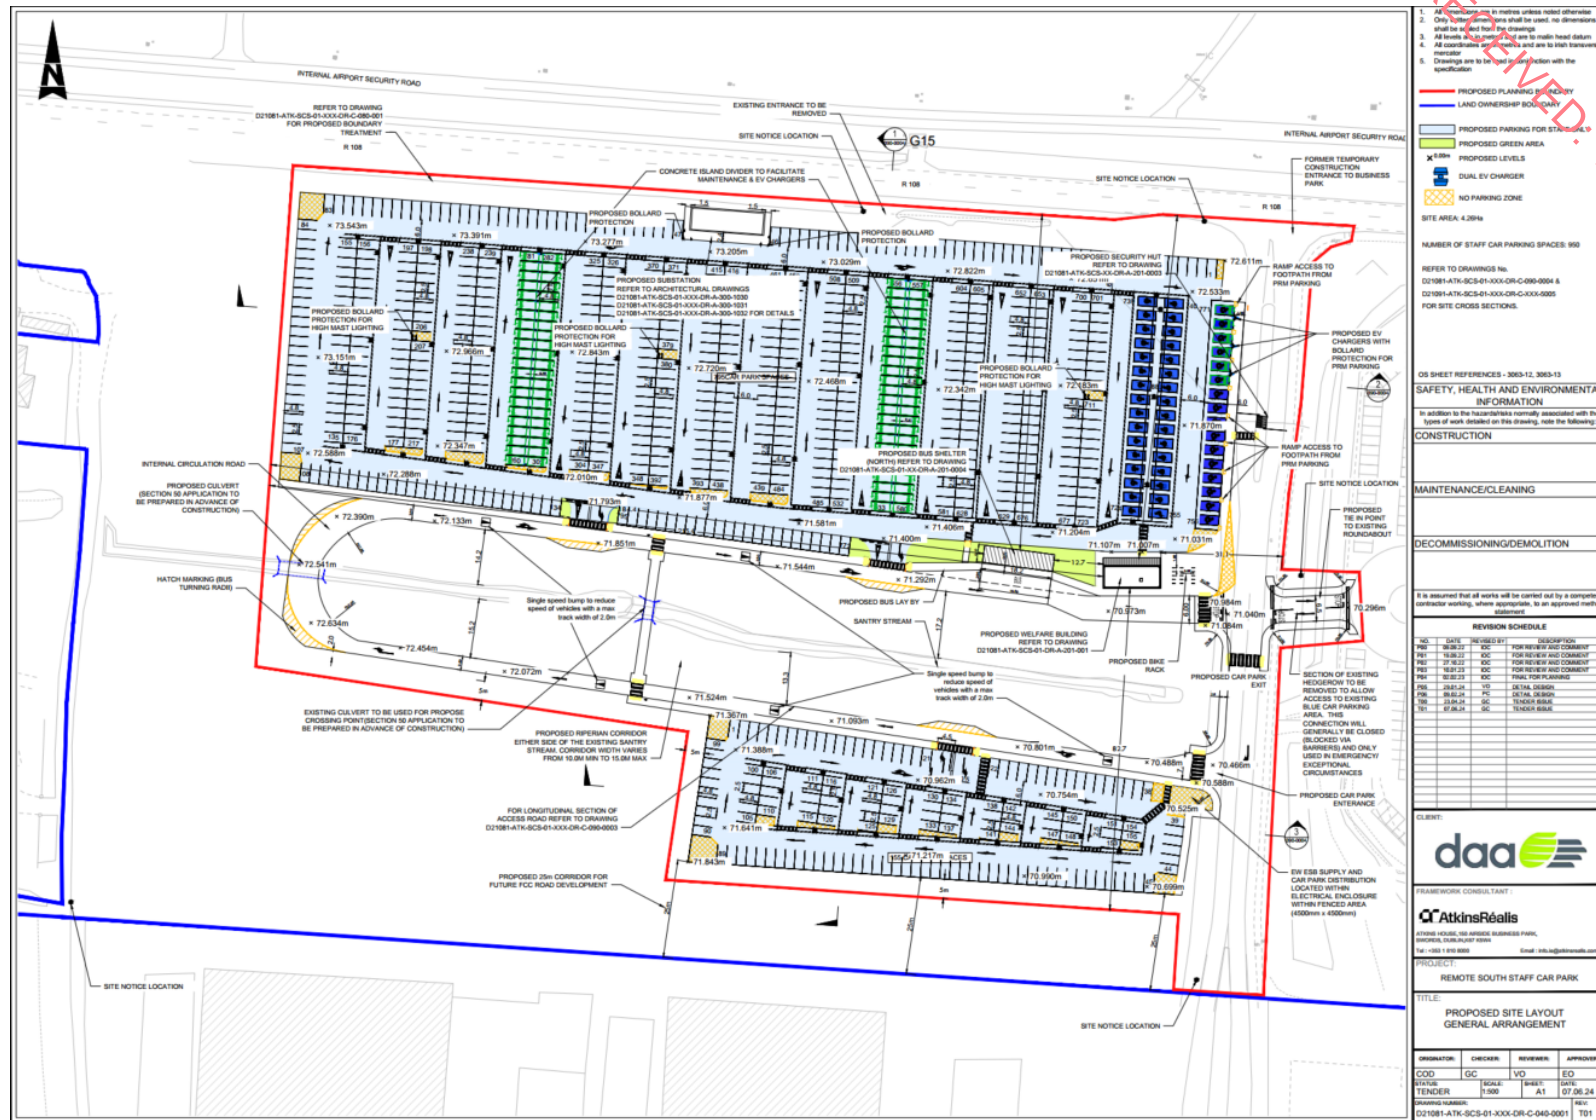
Proposed Site Layout Plan for Remote South Staff Car Park
